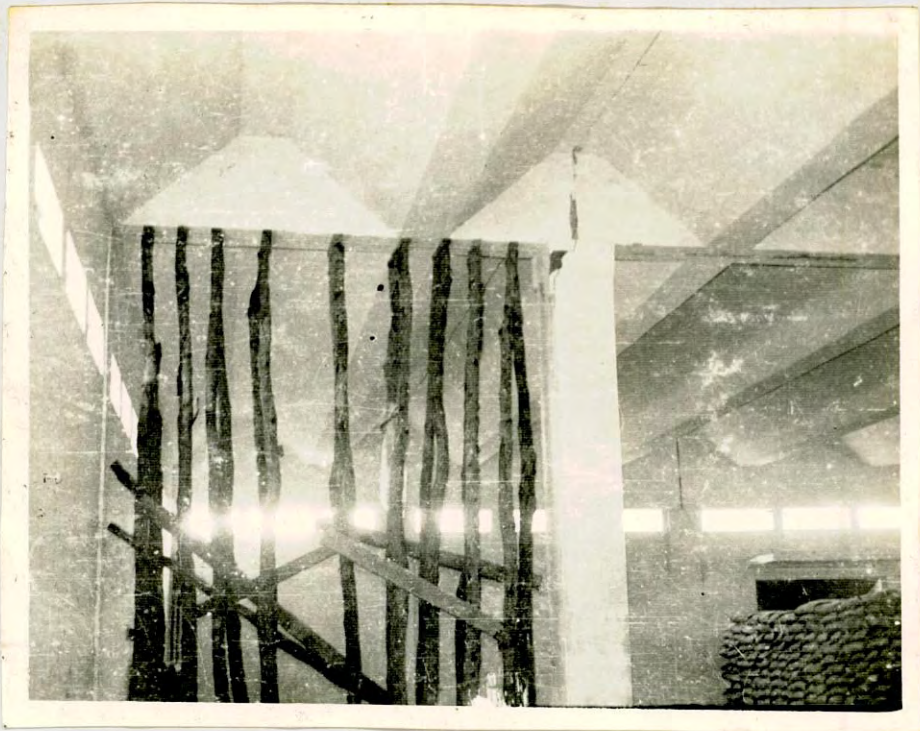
Cracks in beam in a folded plate roof structure in Comilla.
